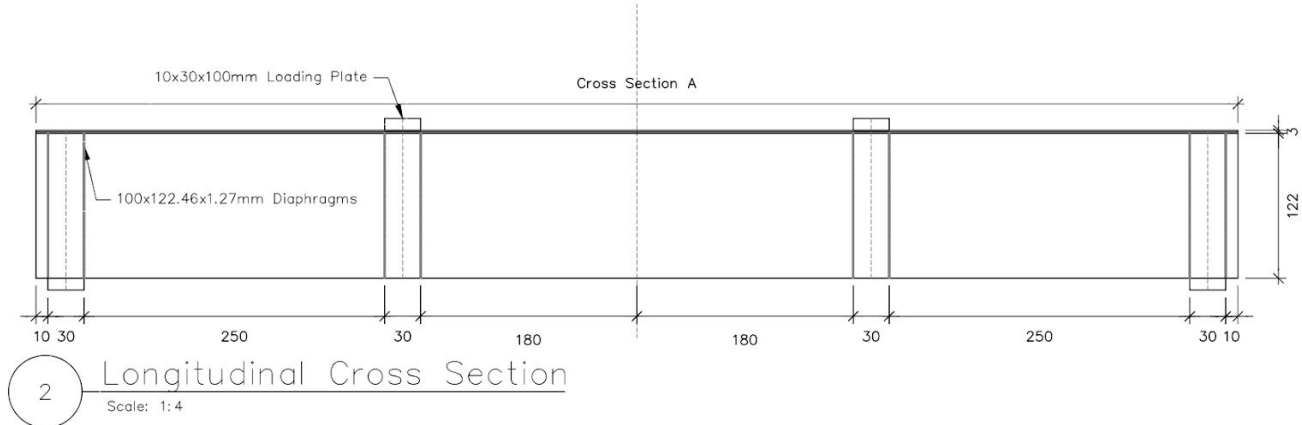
The Longitudinal Cross Section of the Concept 1 Bridge
